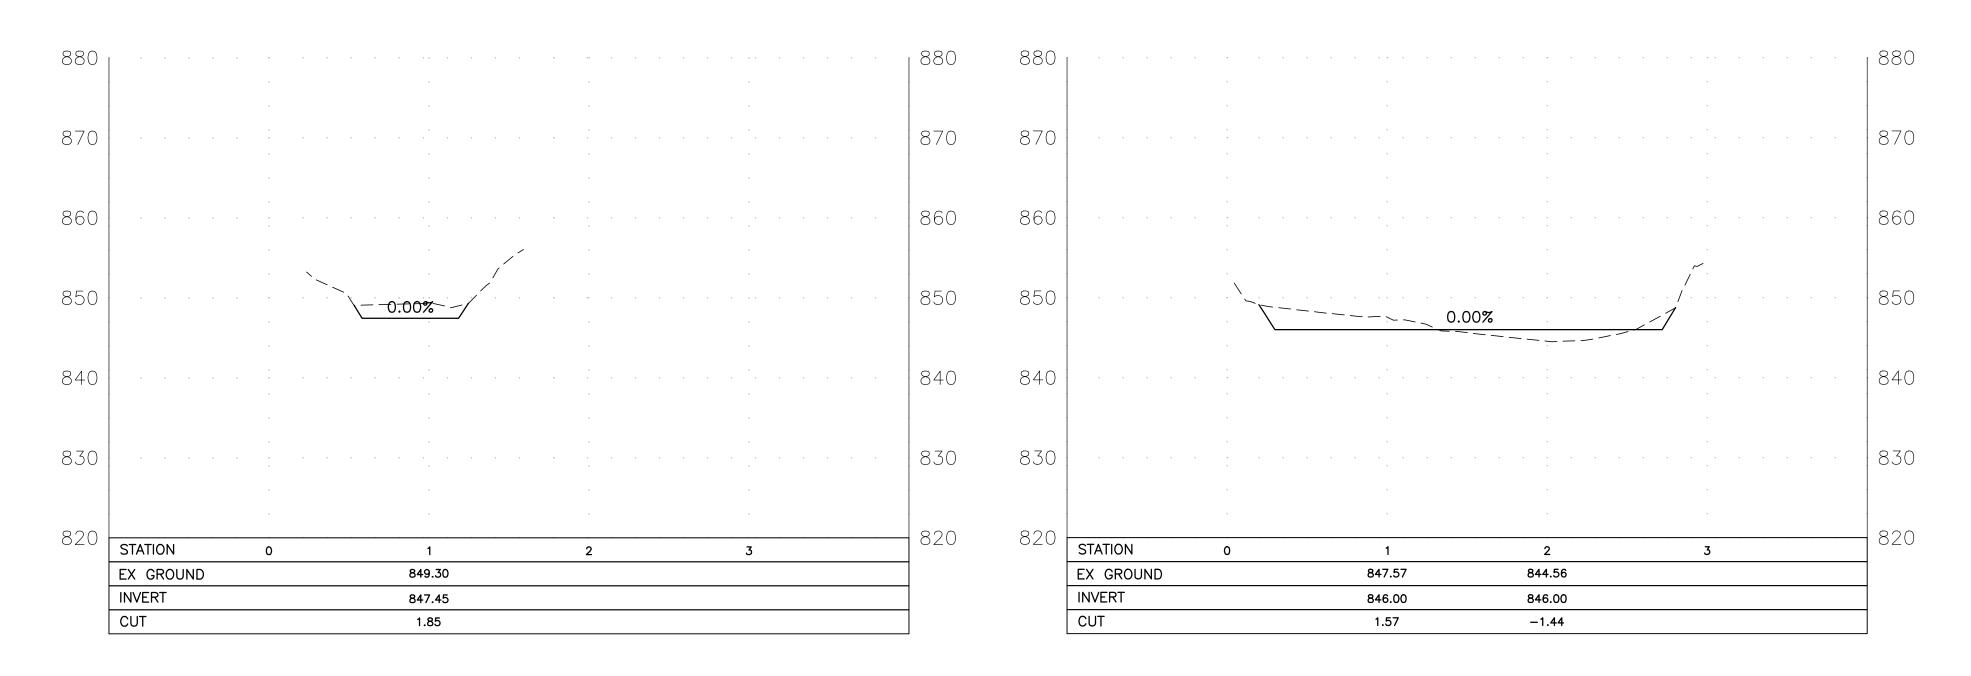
SOUTH LAKE SECTIONS - SLOPED BOTTOM
